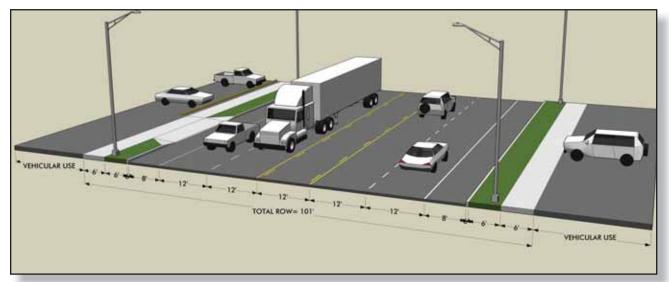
Typical Section from Lincoln Road to Parham Avenue
